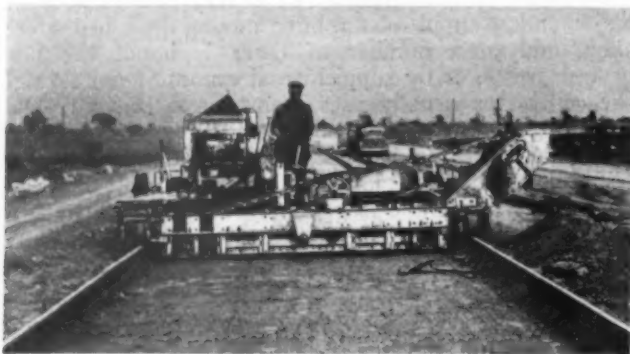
Subgrader on John H. Swanger Job Prepares the Fine Grade to Proper Cross-section. On Two Jobs 24 ft. Machines Are Working, the Rest are 12 ft. Units
